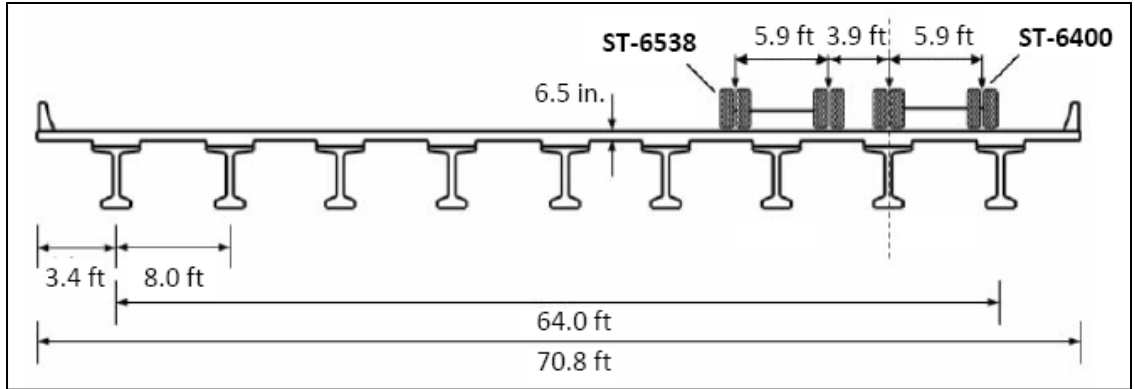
Bridge cross section and transverse position of test trucks (Fason and Barnes 2004)
